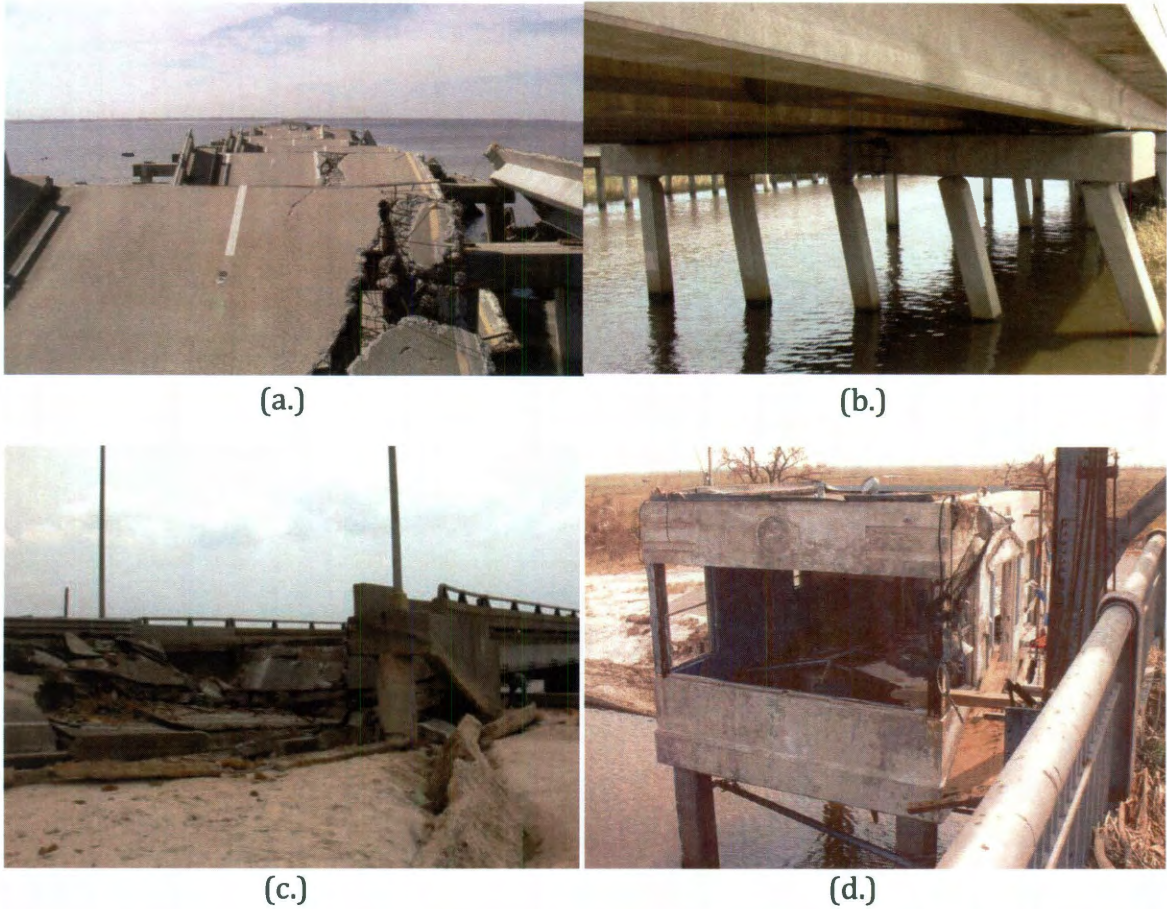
Failure Modes Evidenced in Hurricane Katrina (Padgett et al., 2008) (a.) Bridge Deck Uplift/Unseating; (b.) Impact; (c.) Scour under Approaches; and (d.) Inundation of Electrical/Mechanical Equipment.
